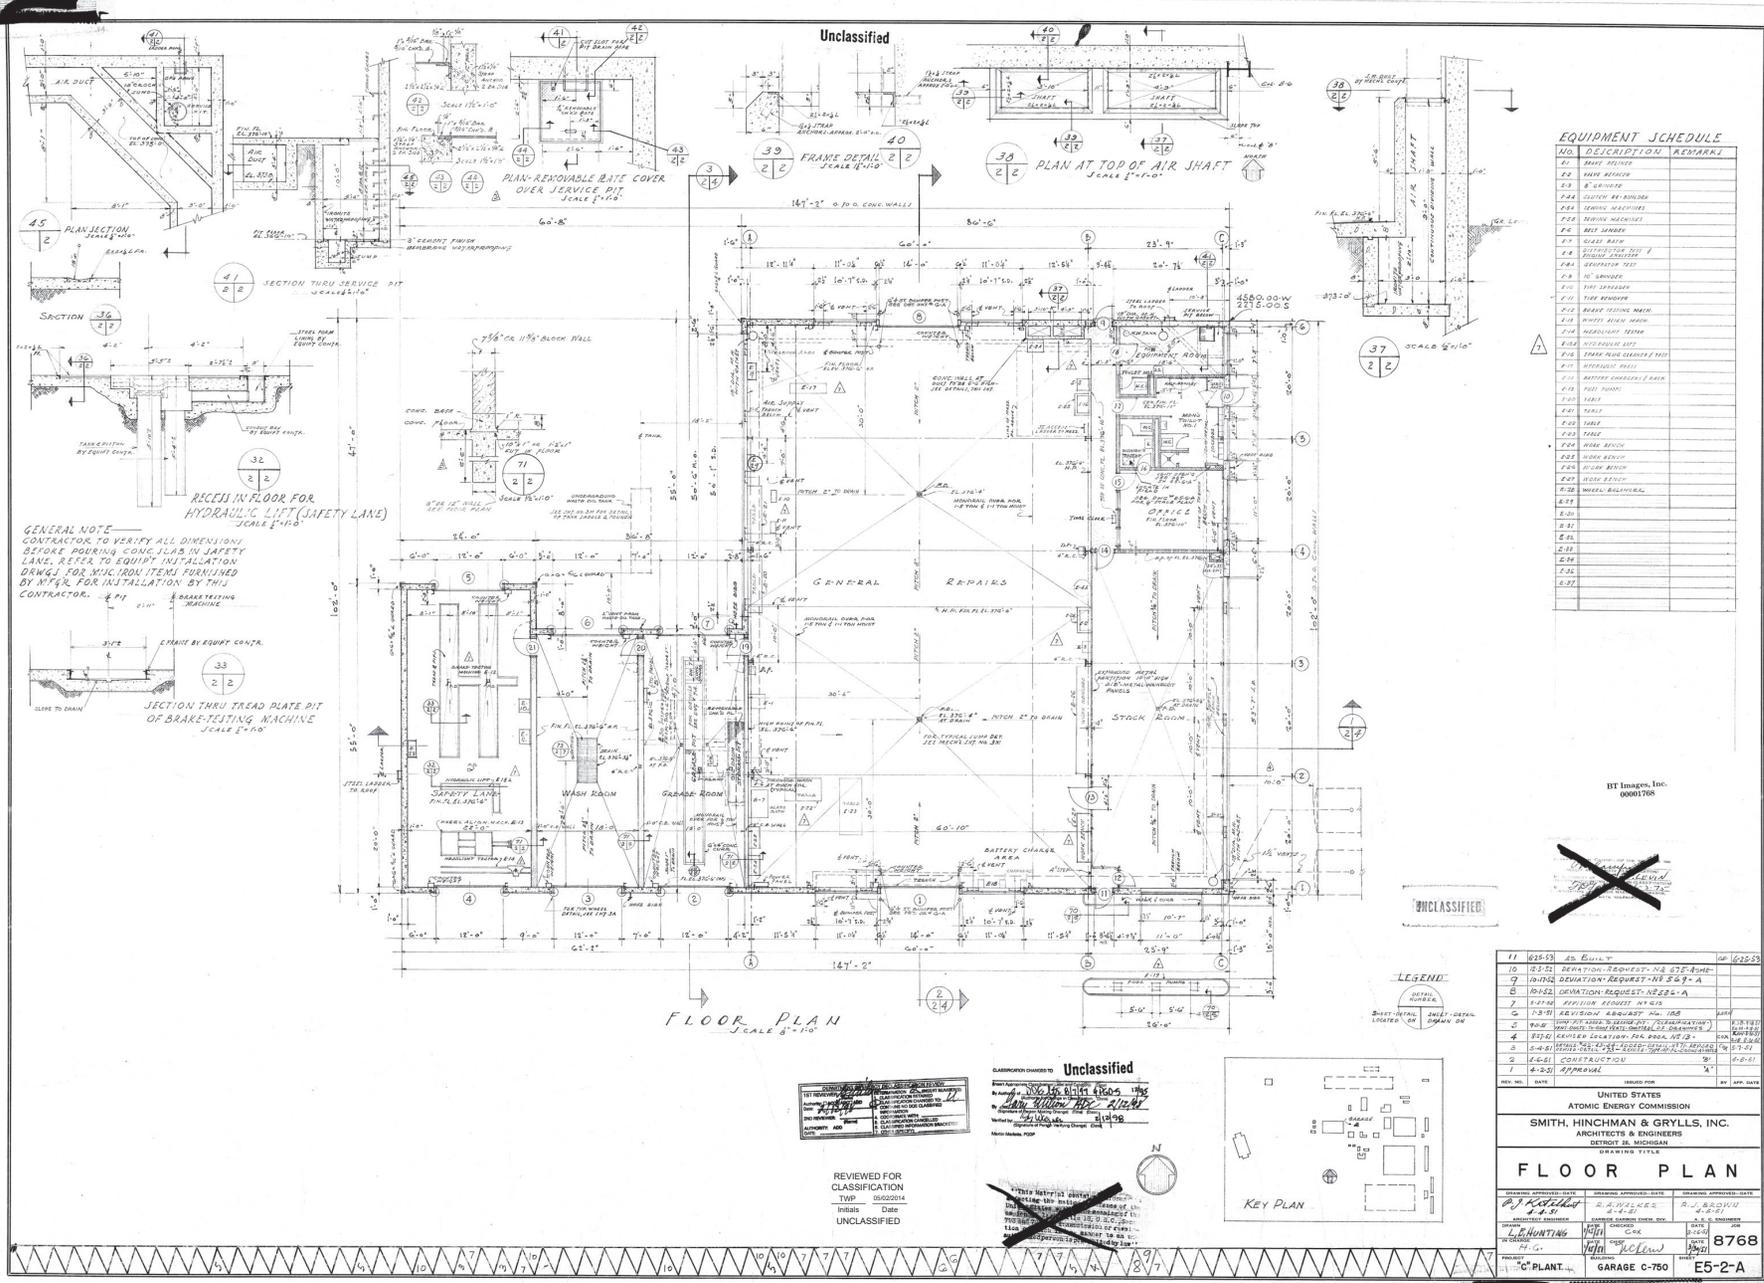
Engineering Drawing E5-2-A_0001_U-017124
